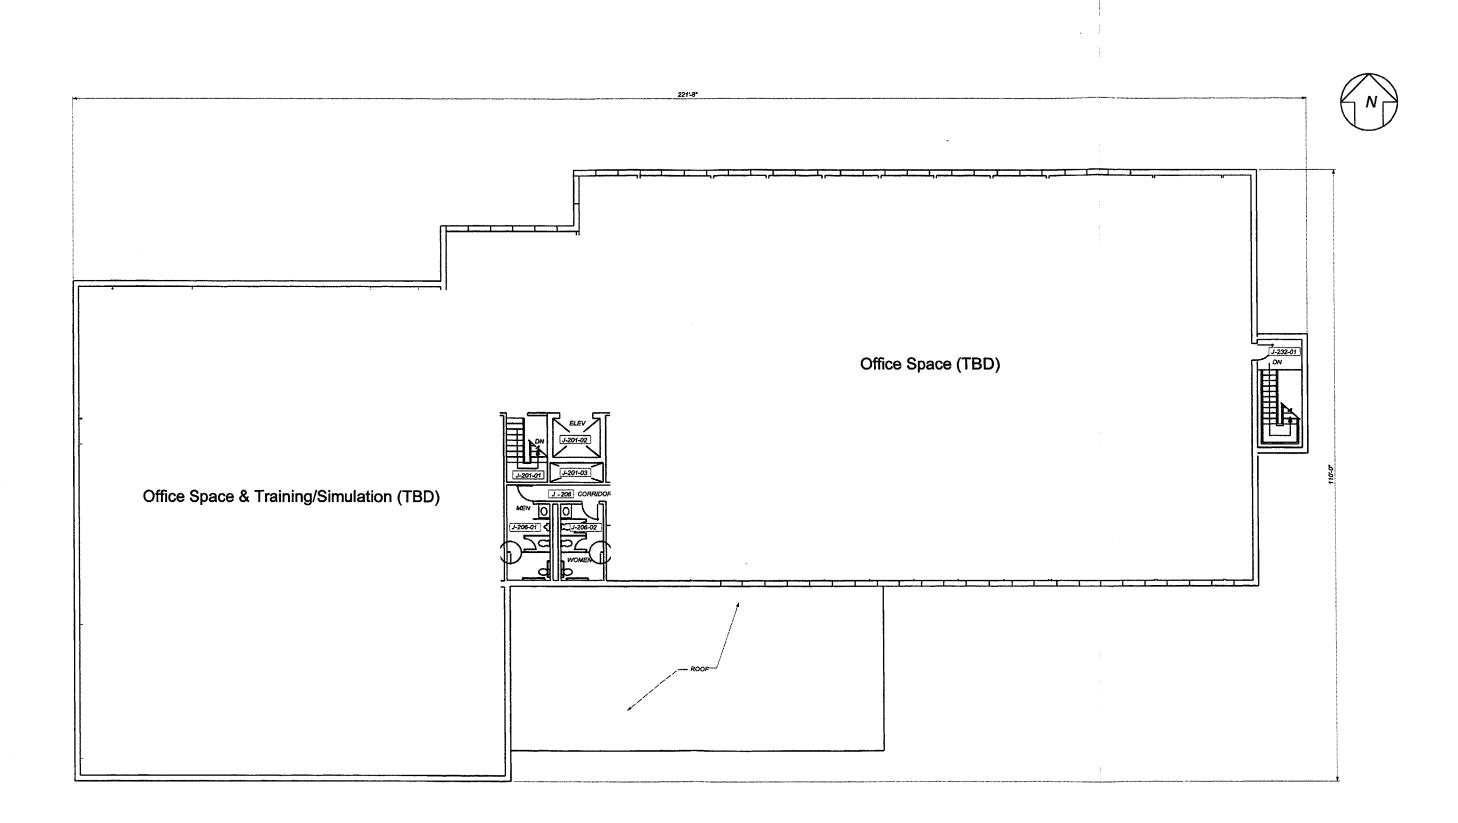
General Arrangement - Administration Building (BAD) - Conceptual Layout - Second Floor
